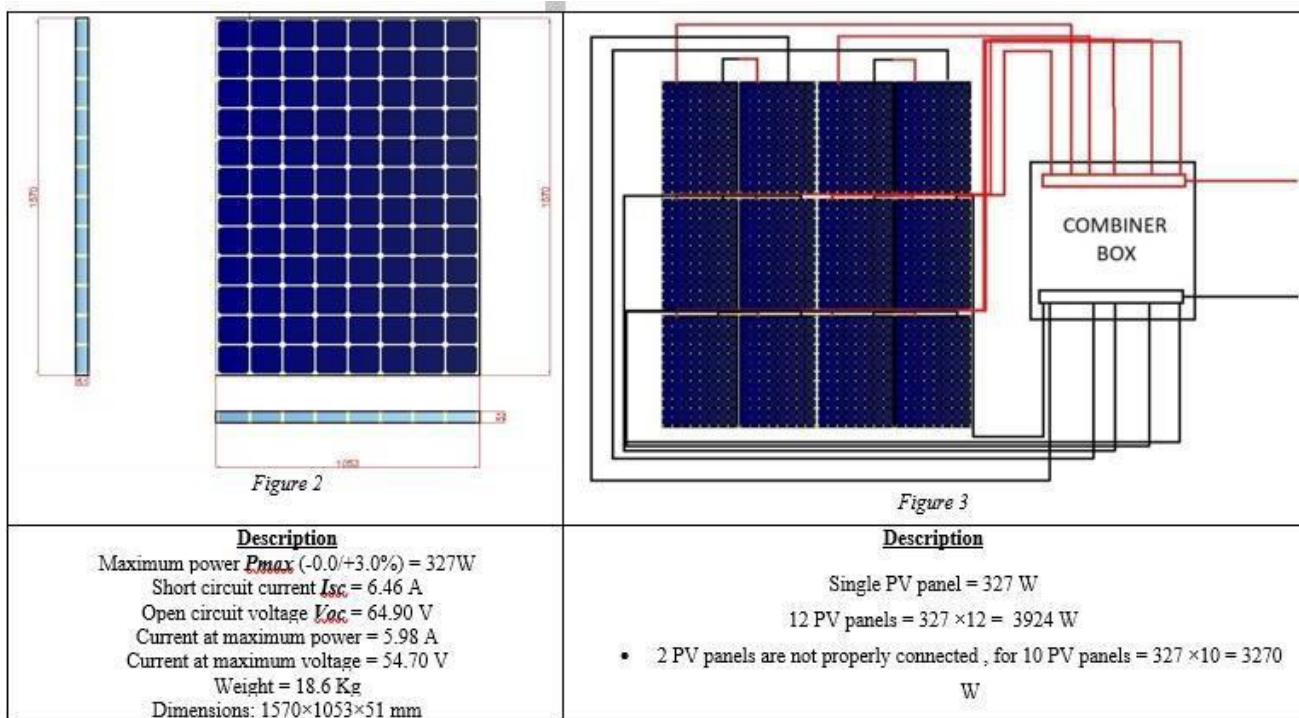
and 3: Multi View drawing of Single photovoltaic panel with dimensions and descriptions
